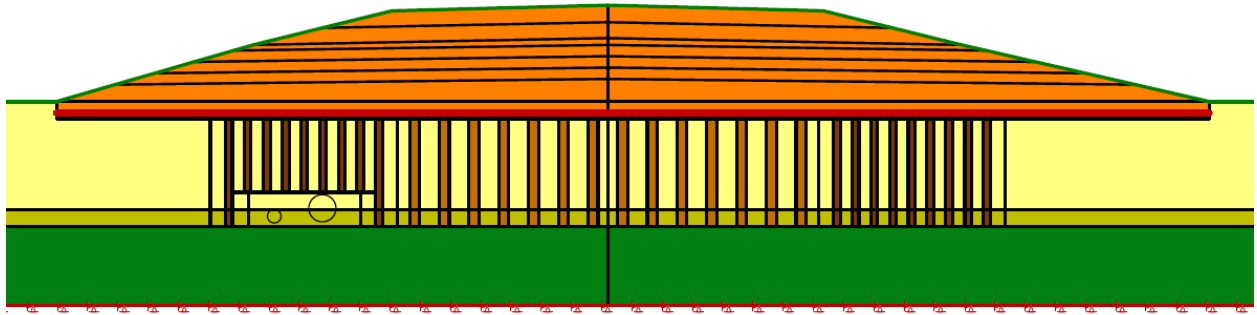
FEM South Abutment Cross-Section Model Case A
